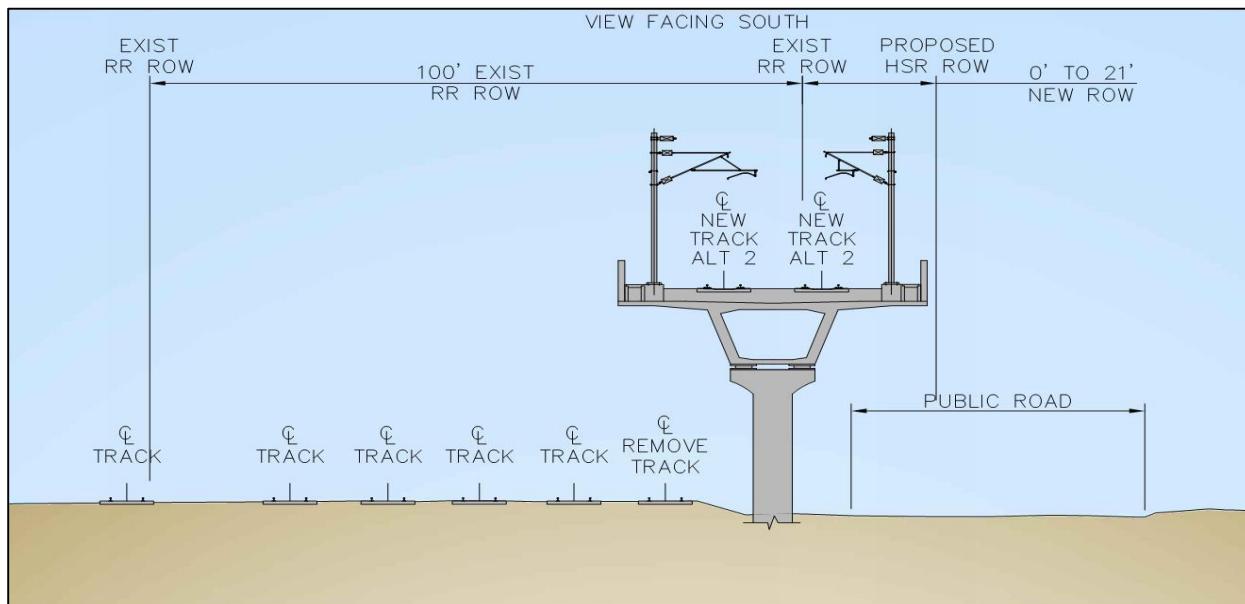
Alternative 2 – Typical Cross-Section – LA River West Bank: Approaching Redondo Junction
